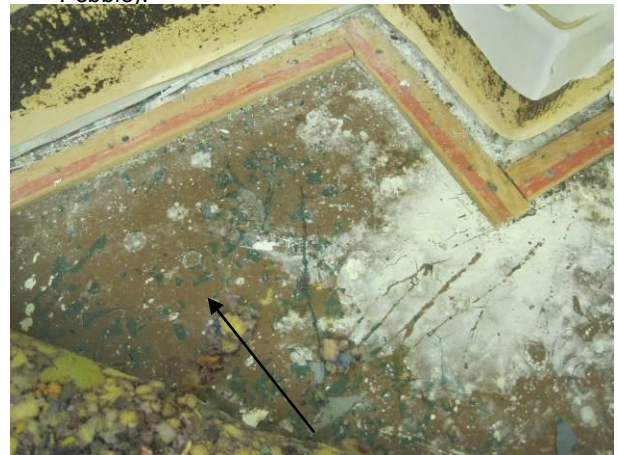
Asbestos-containing Floor Coating (Brown / Green).
